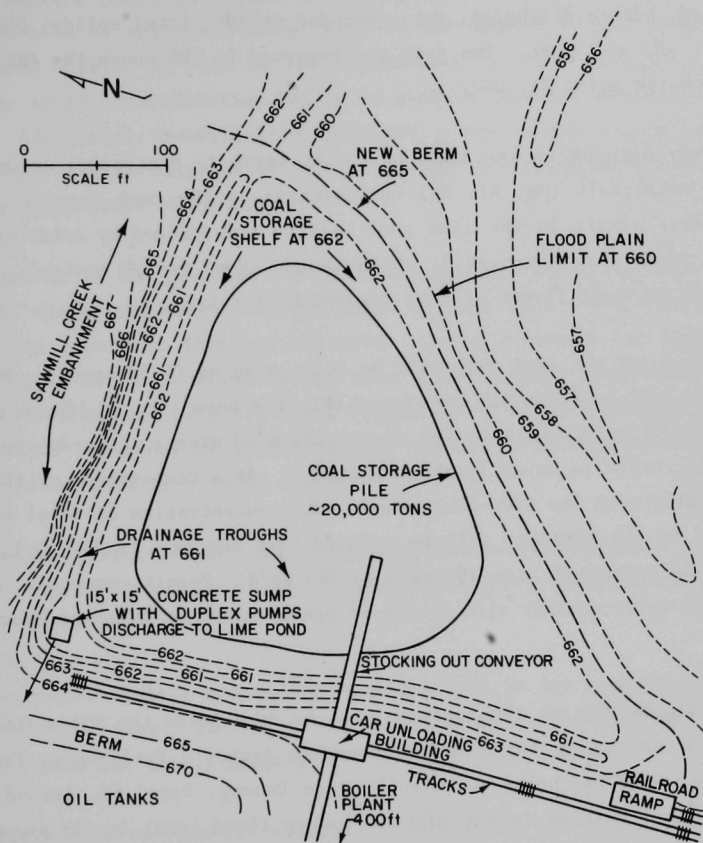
Plan View of Proposed Coal-Storage System. (100 ft = 30 m)
